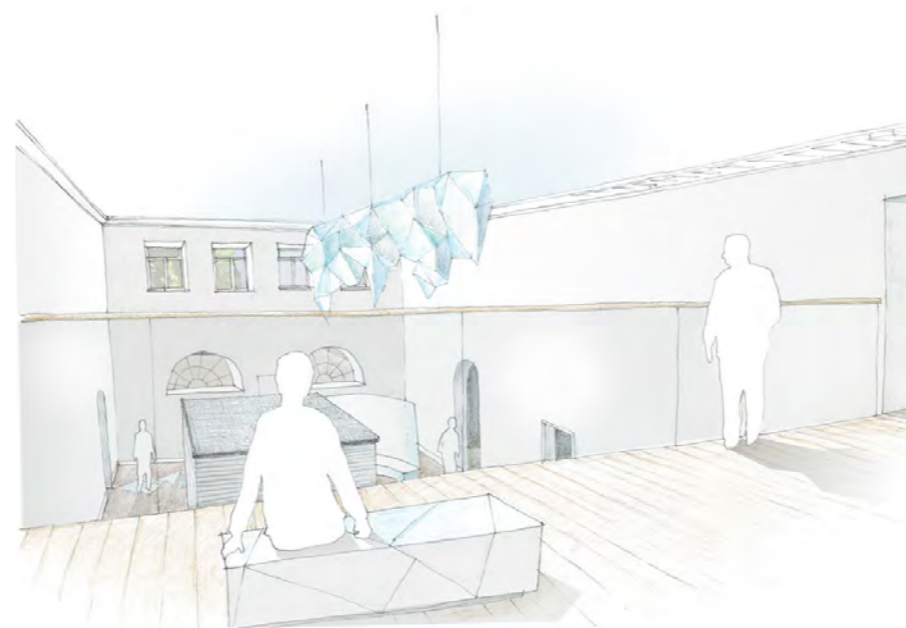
View from second floor Mezzanine looking down on the Shackleton Cabin
